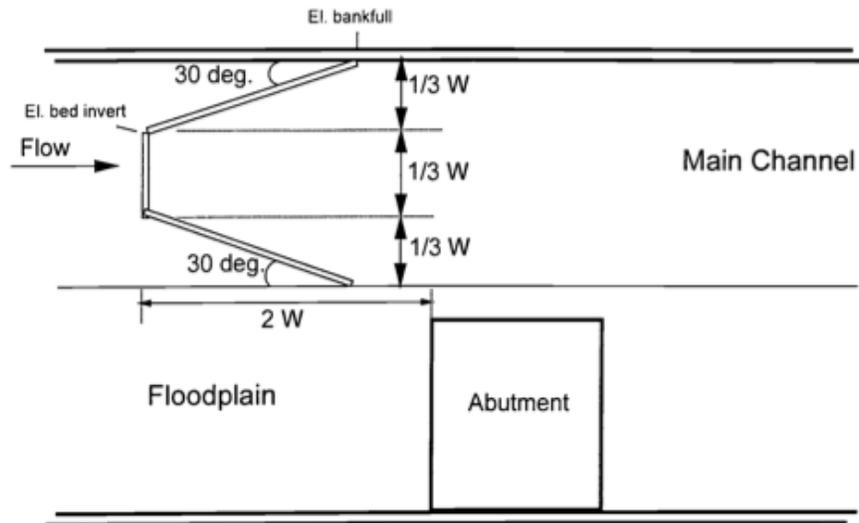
Plan View of Rock Step (Rosgen, 2006).
